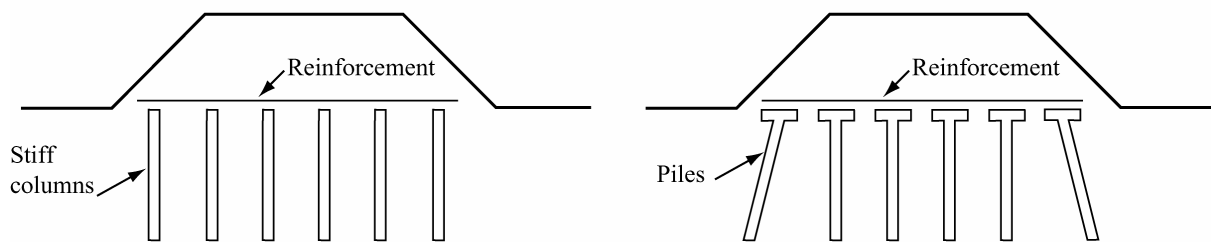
Stiff columns and piled embankment with basal reinforcement.
